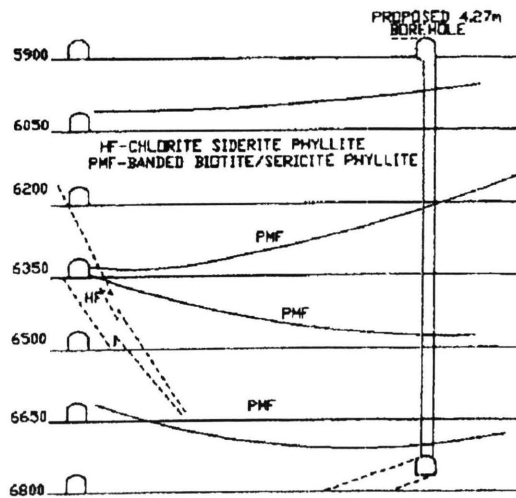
Condemnation diamond drillhole layouts and geology for the proposed raise location.
